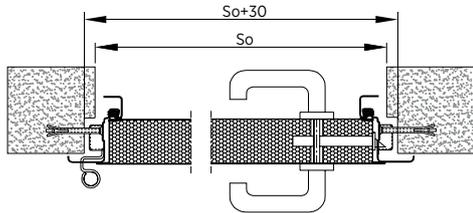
Installation of the single-leaf door with a corner frame without a thermal break to a masonry wall - horizontal cross-section
